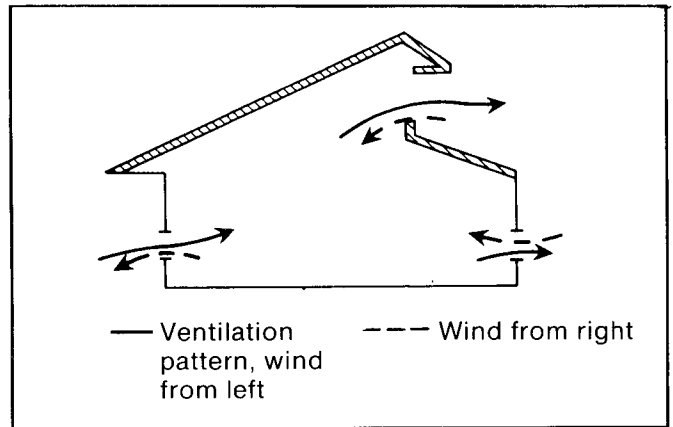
Whole-House Ventilation Through Clerestory Windows
